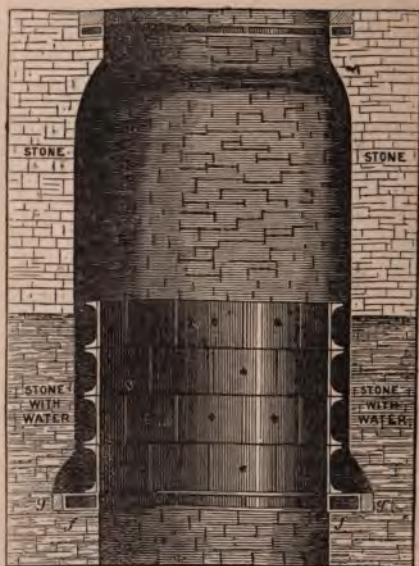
f*, wedging crib of iron; *g*, oak wedging pieces; *k*, iron tubbing.
